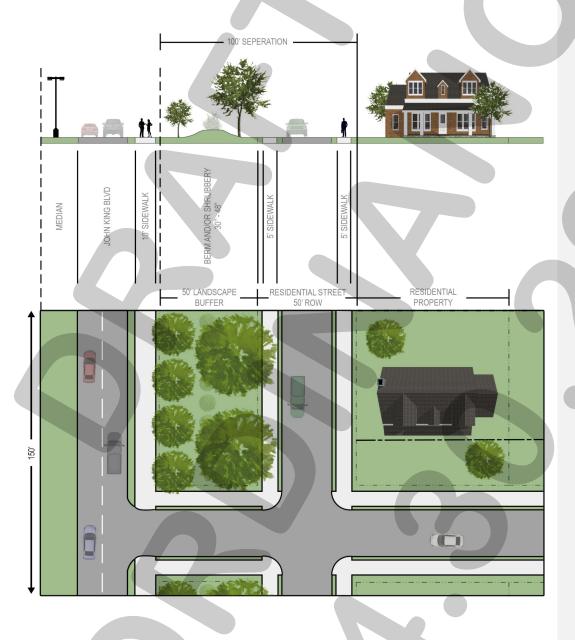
DESIGN ALTERNATIVE #4; SLIP STREET
